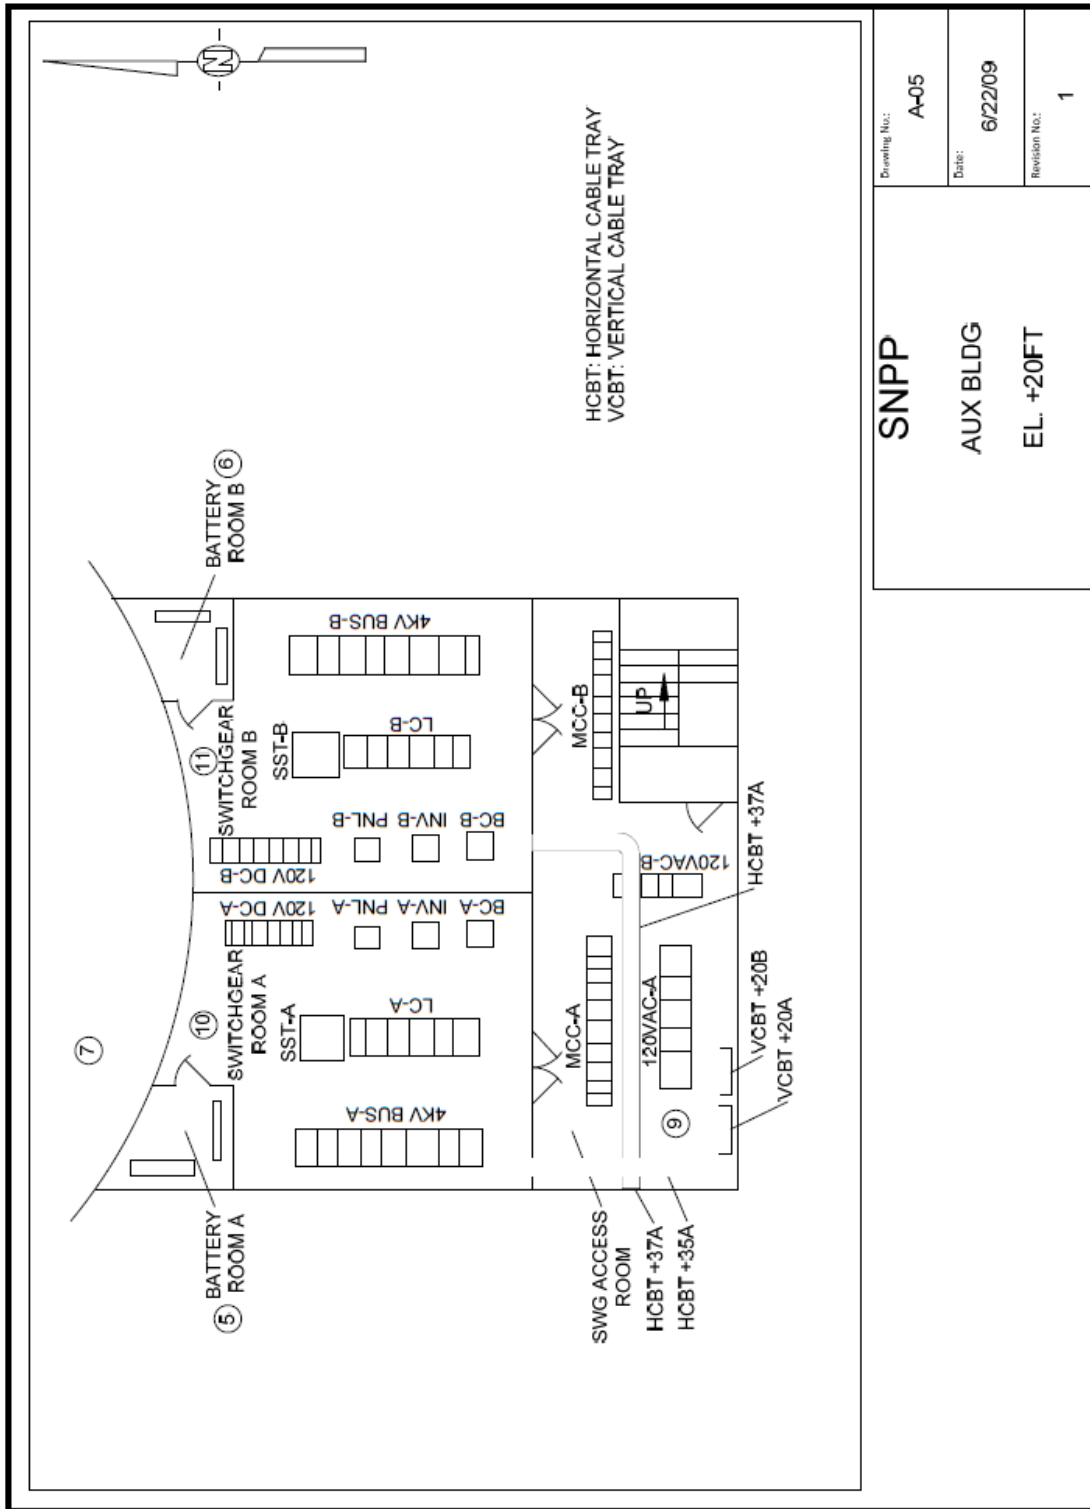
Auxiliary Building – Elevation +20 Ft.
